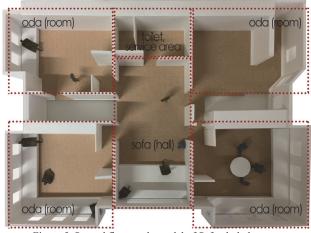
Second floor study model of Safranbolu house. (Source: Author)
